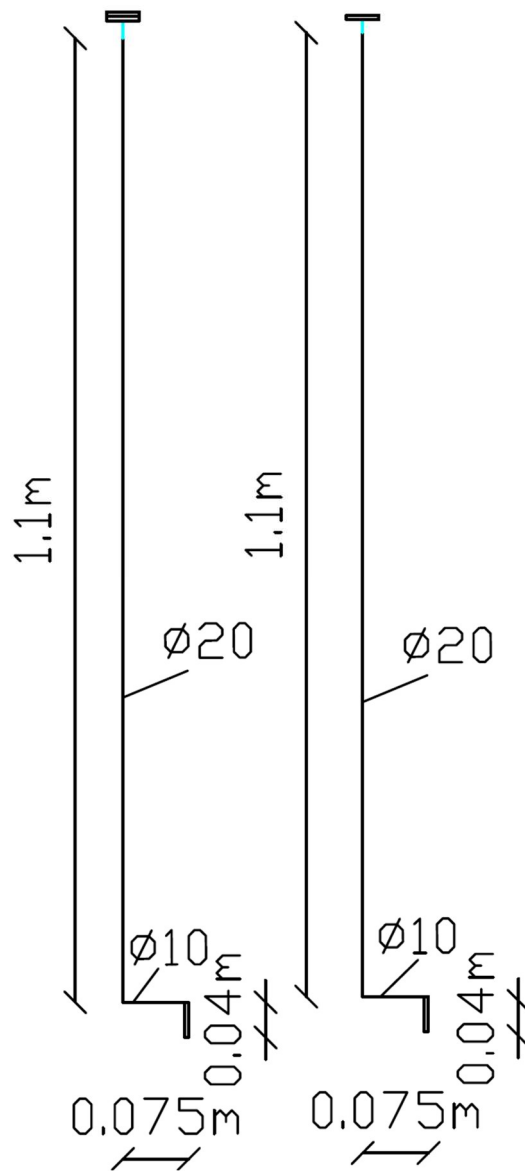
Cross section of living wall 1-4 left, 1-4 right
